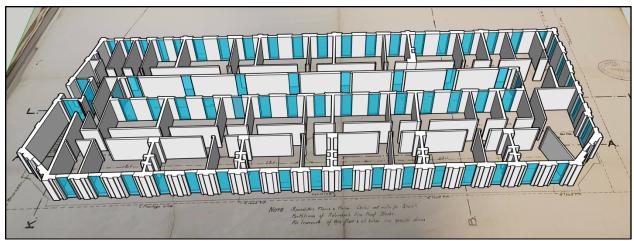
Over-head view of the floor-by-floor fourth floor model. This floor housed male assistants, but the floorplan was largely the same on the third floor for women, and the fifth floor, also for men.
